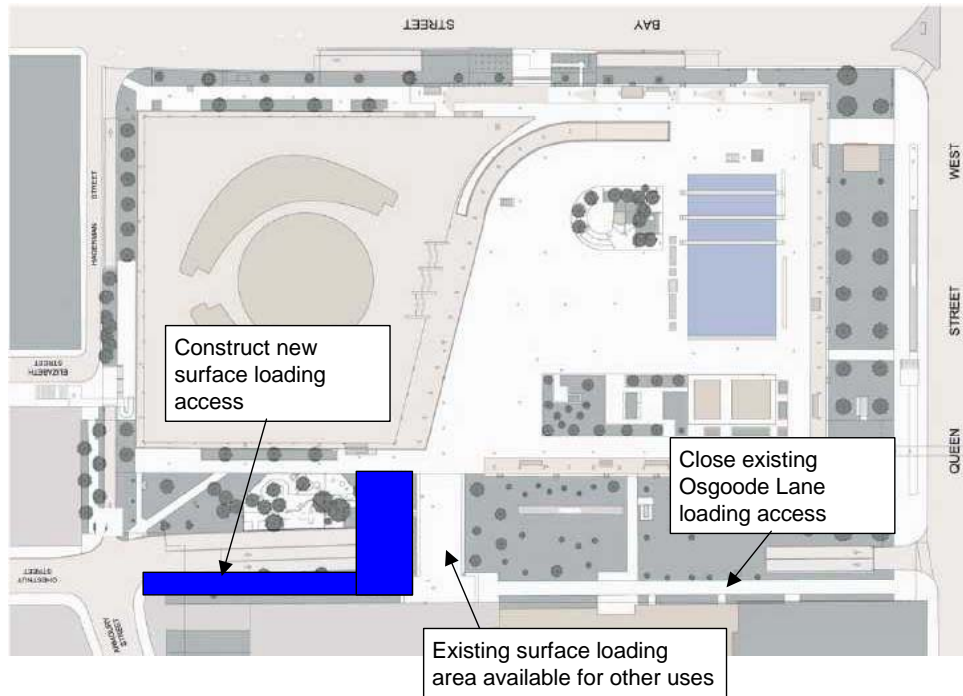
Assessment of Reconfigured Loading Access
